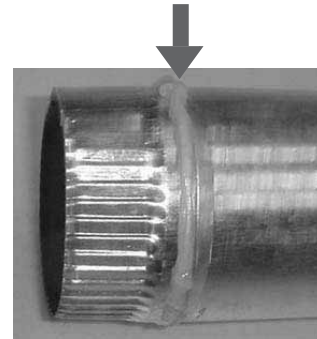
Attaching Double-Wall (Type B) Pipe to Single-Wall Pipe
